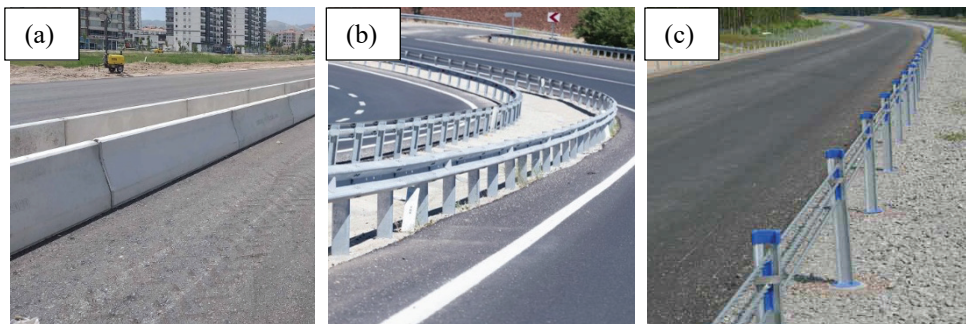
(a) Concrete barriers (rigid), (b) Steel guardrails (semi-rigid), (c) Cable guardrails (flexible)
